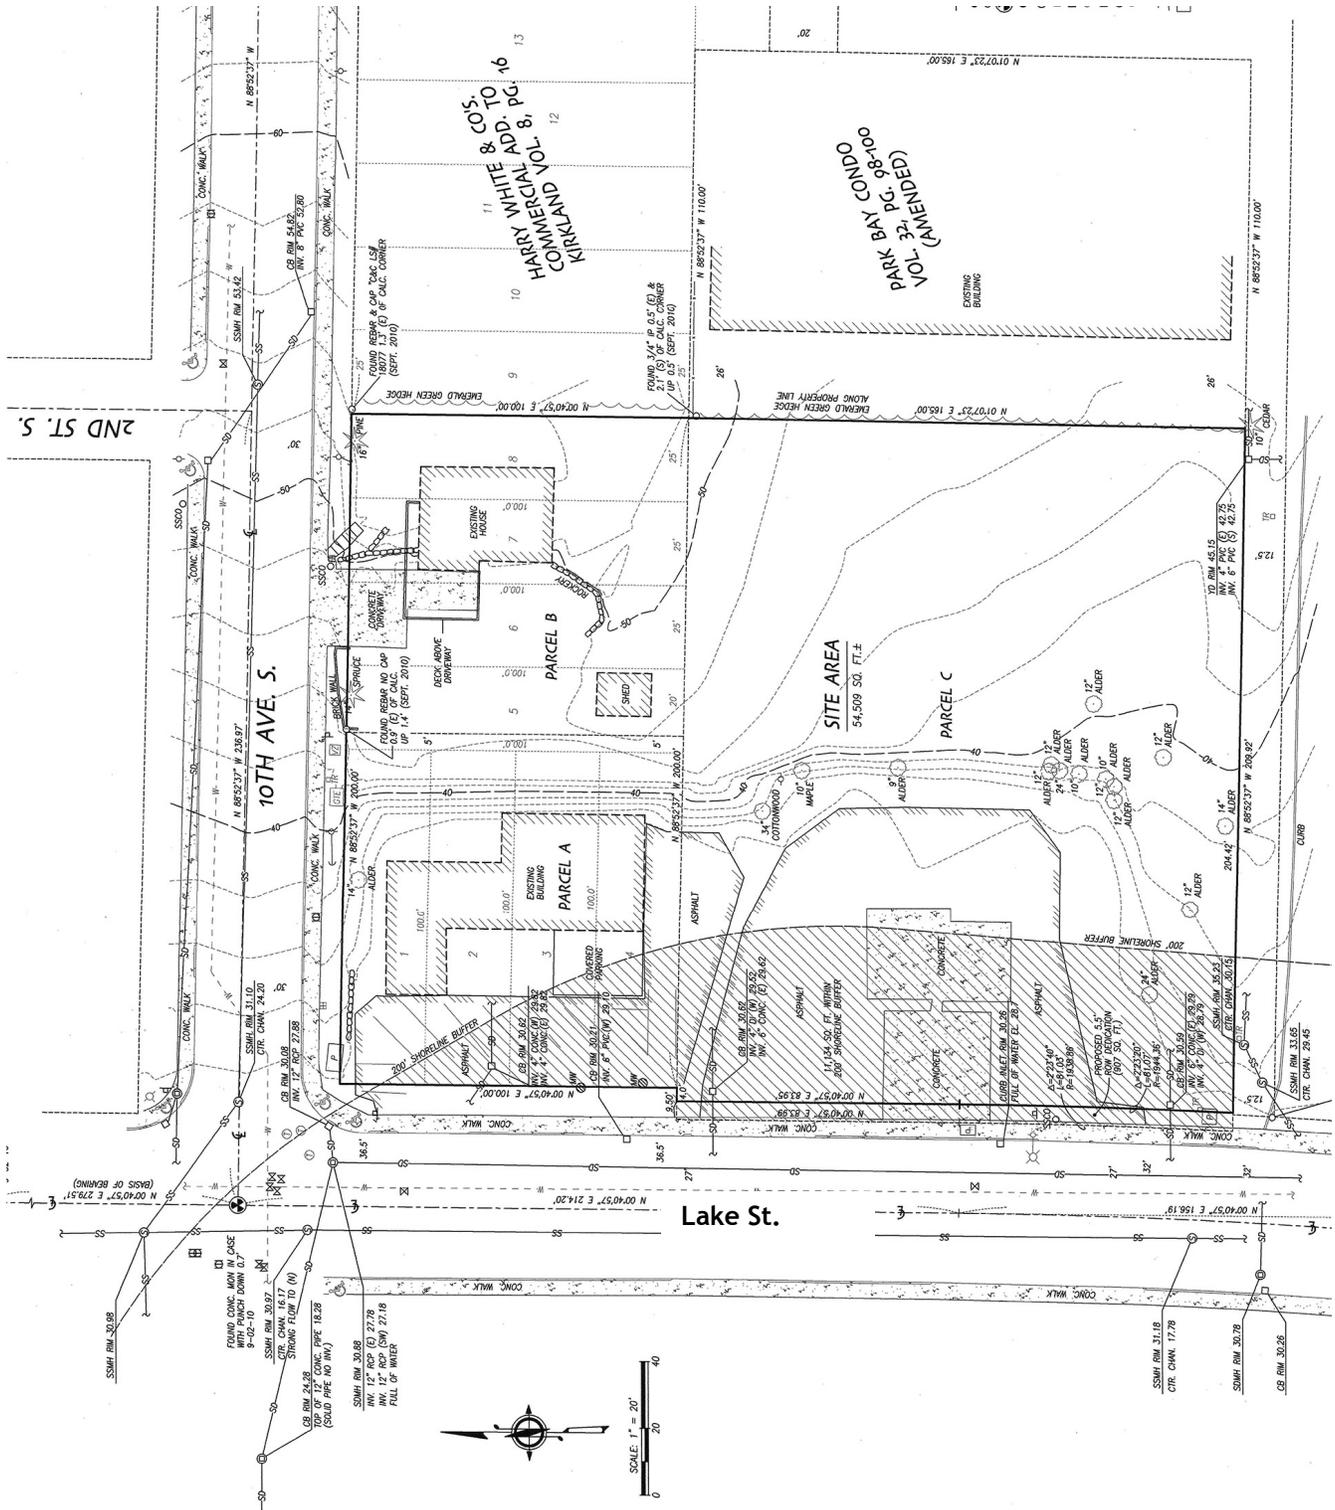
EXISTING FEATURES SITE PLAN
